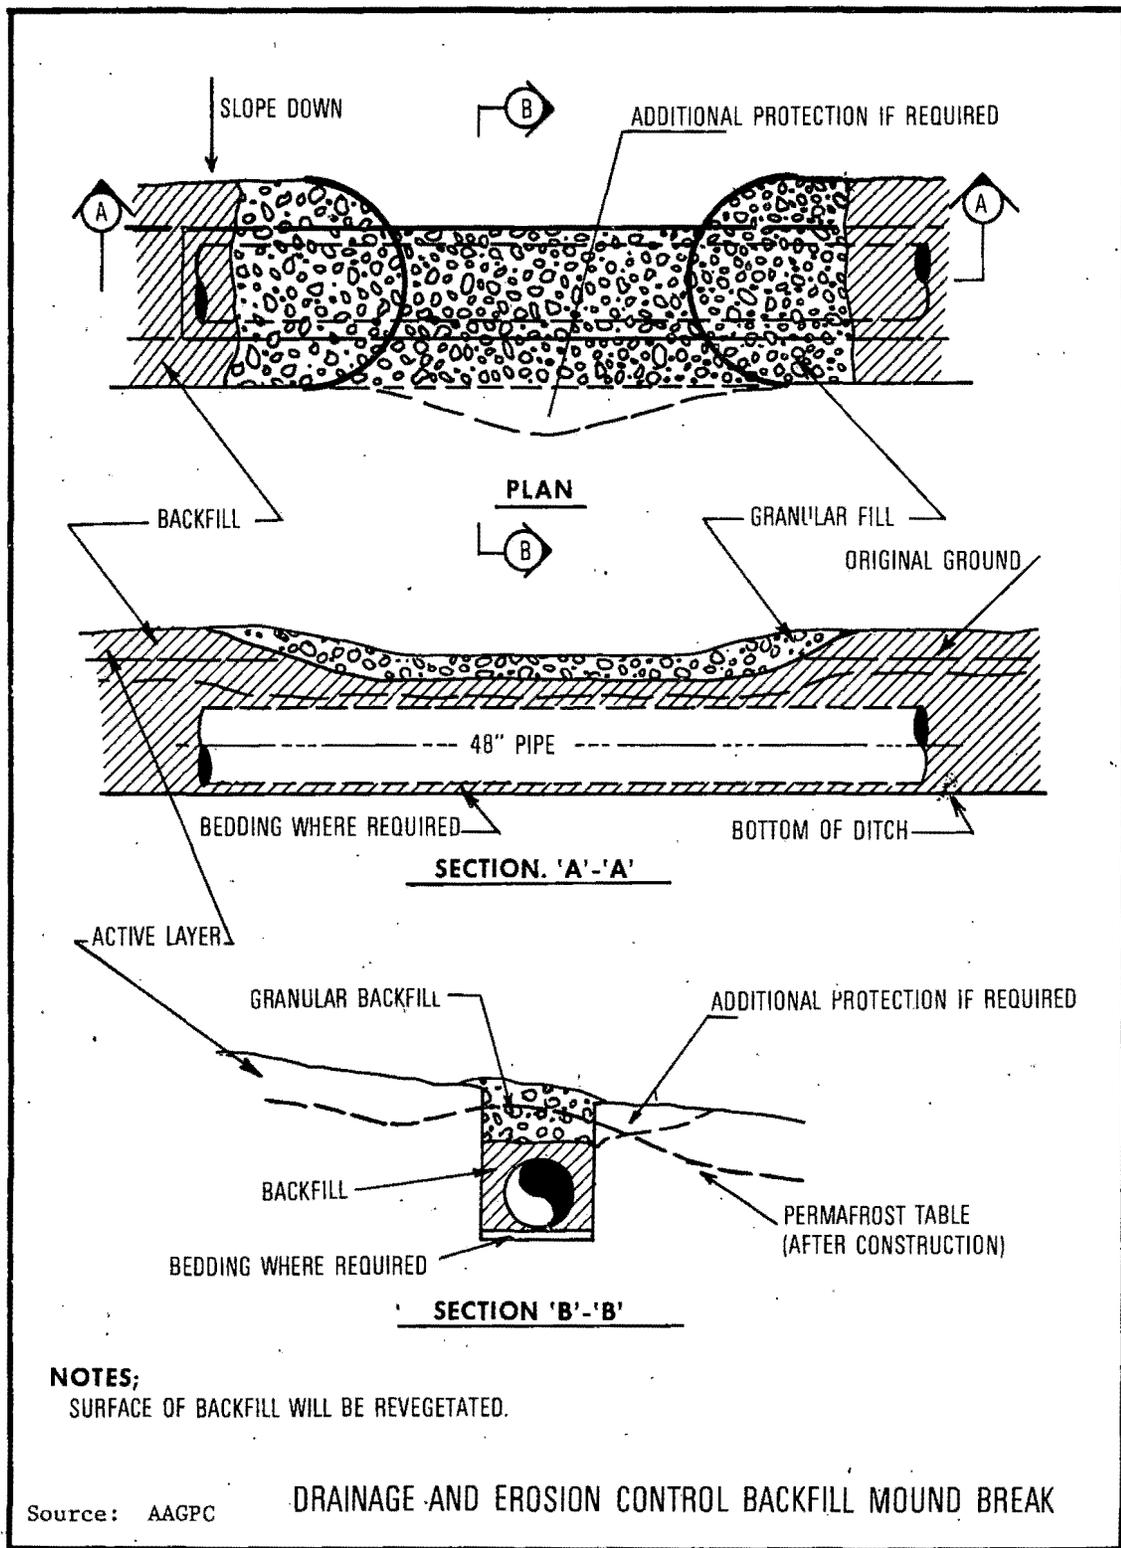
Drainage and erosion control by breaks in backfill ditch mound
